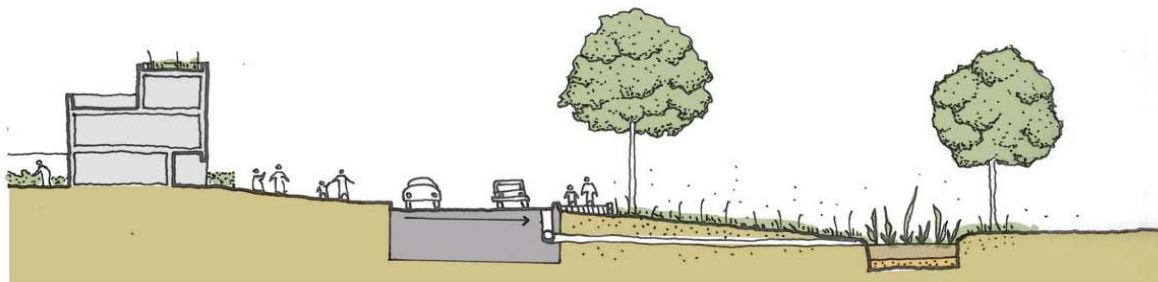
Street design to drain to adjoining lower ground SuDS feature (courtesy of CIRIA)
